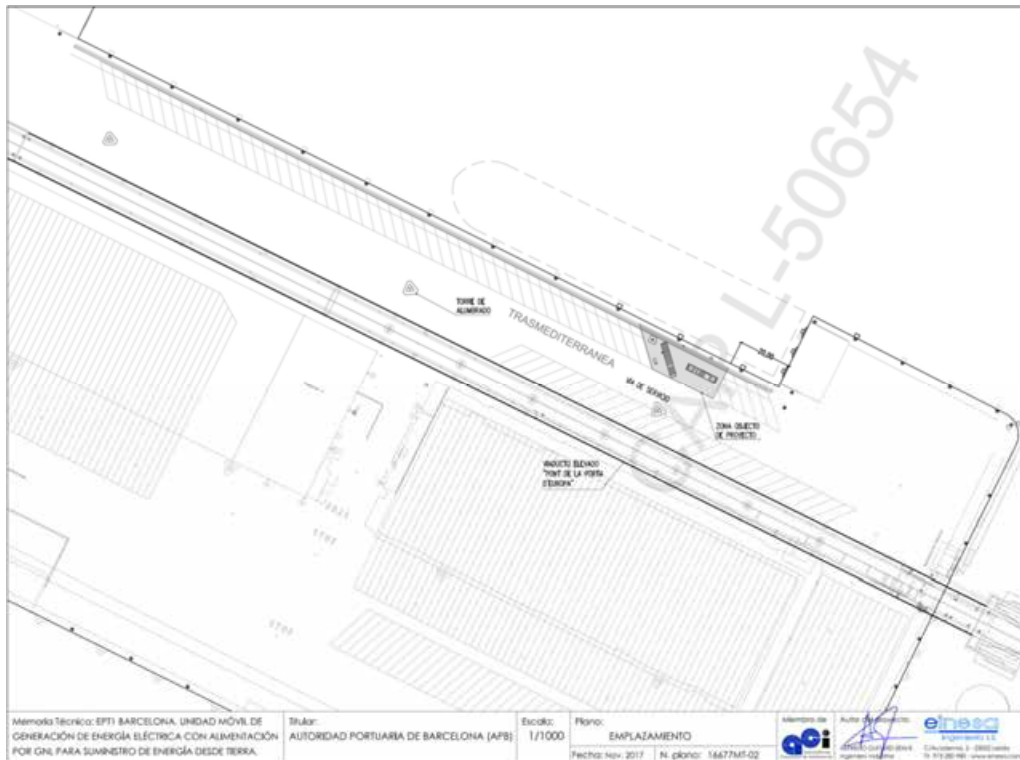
Pilot location. Ponent wharf. Detail of the RoRo ramp, public area of the wharf and Porta de Europa bridge.
